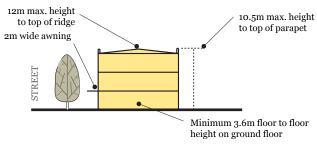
THE SIDINGS SITE SPECIFIC PLAN
